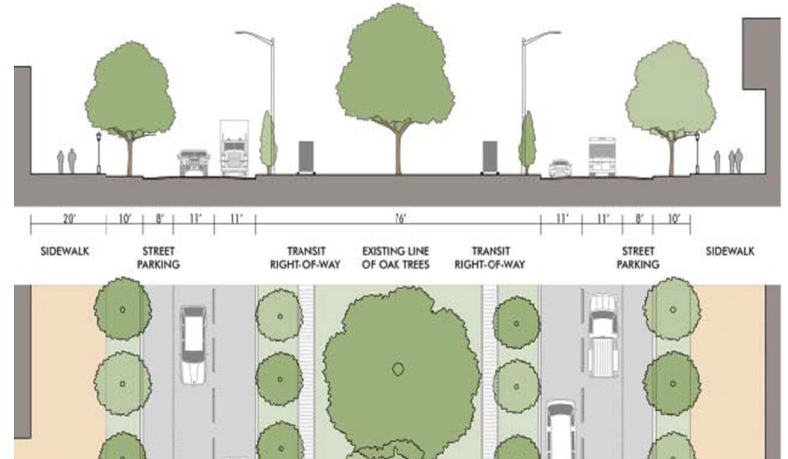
Street Plan and Section of North Claiborne Avenue (Provided by H3 Studios)
